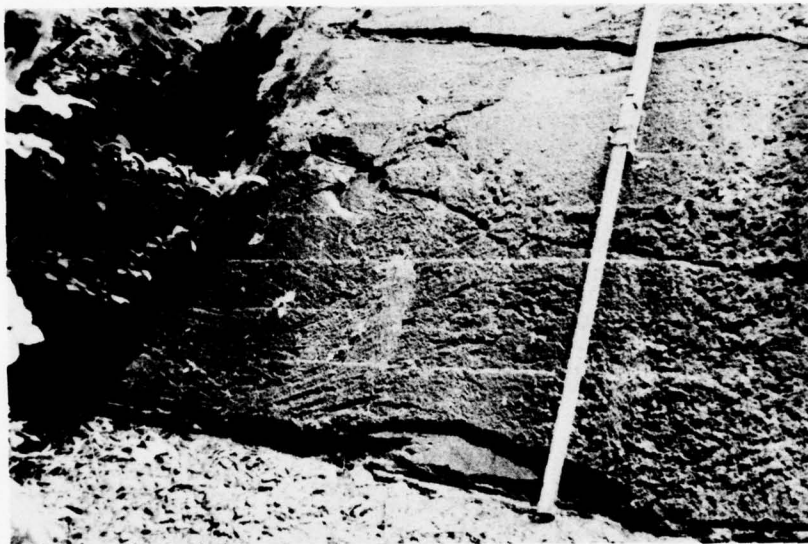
Leakage and spalled surface on spillway right side.
